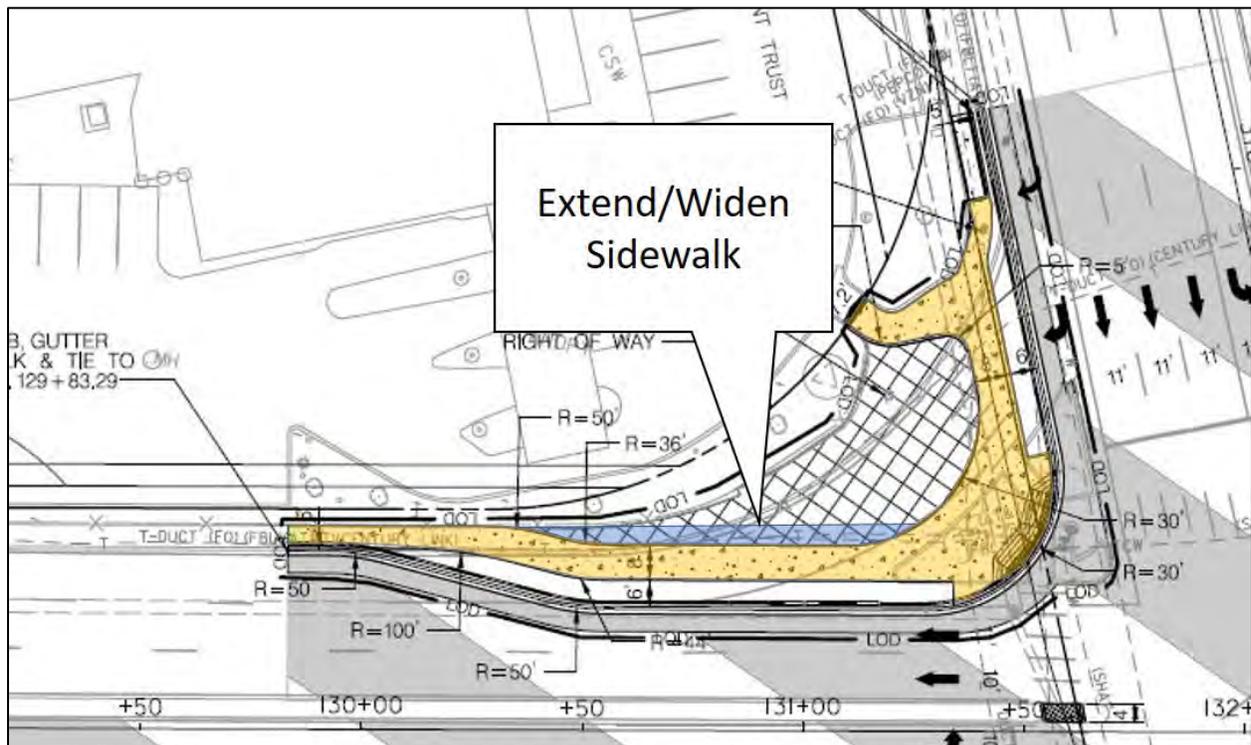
Rockville Pike/Old Georgetown Road Intersection – Potential Sidewalk Improvement
